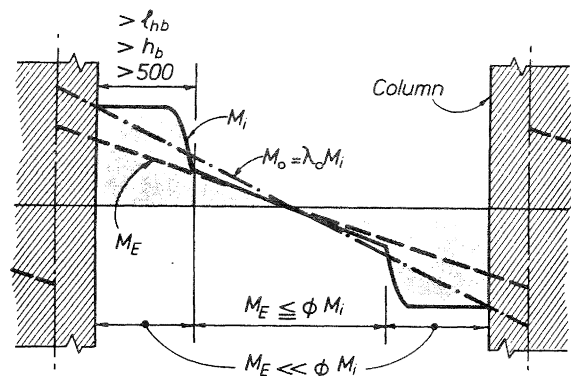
MOMENT ENVELOPES FOR DIAGONALLY REINFORCED SPANDREL BEAMS
